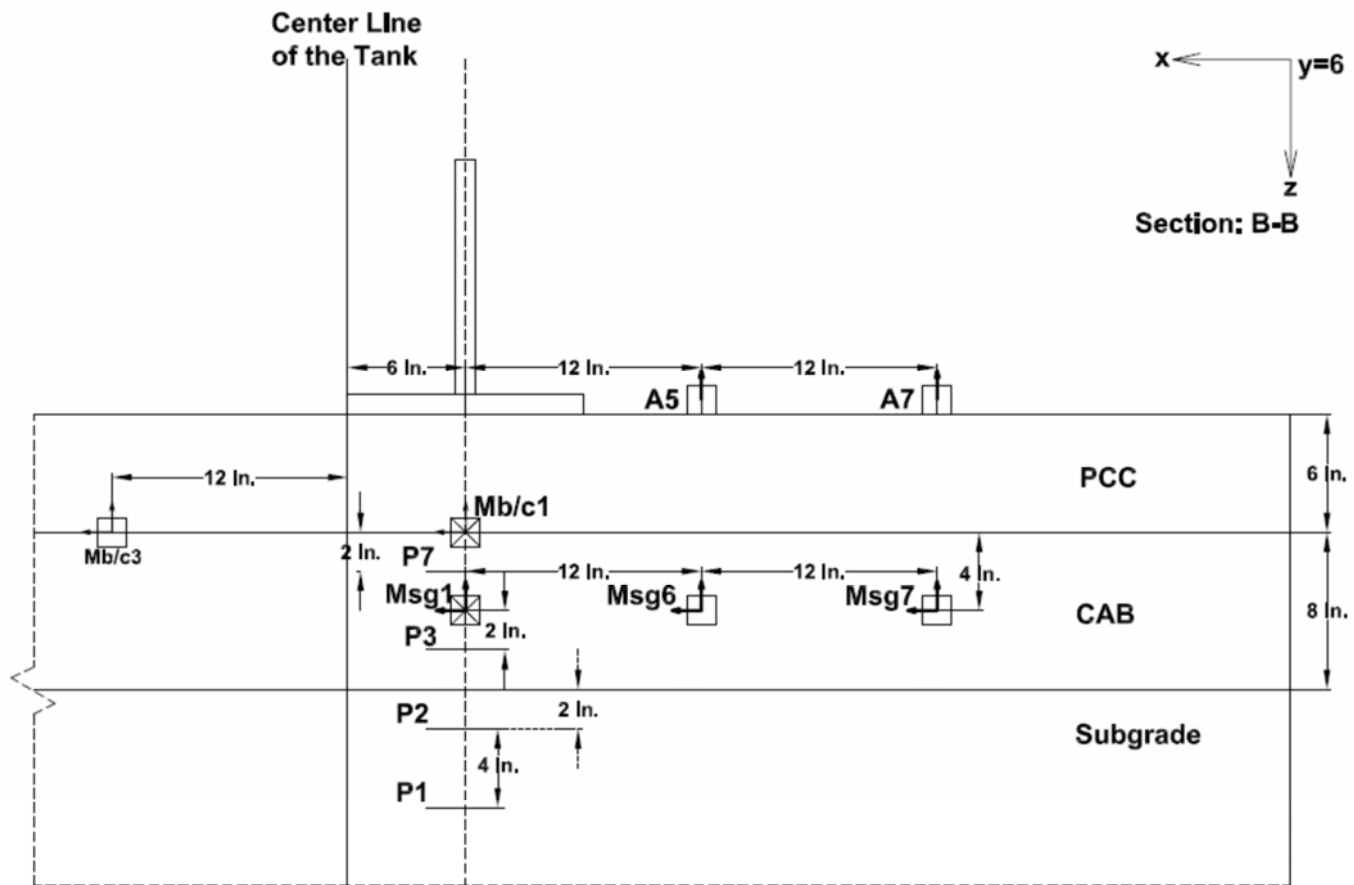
Instrumentation plan for experiment No. 7—Profile view, Y=6 inches
